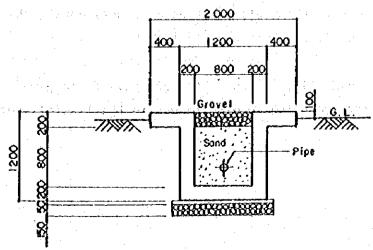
Piping Trench Section for Pipe Laying Training Yard
